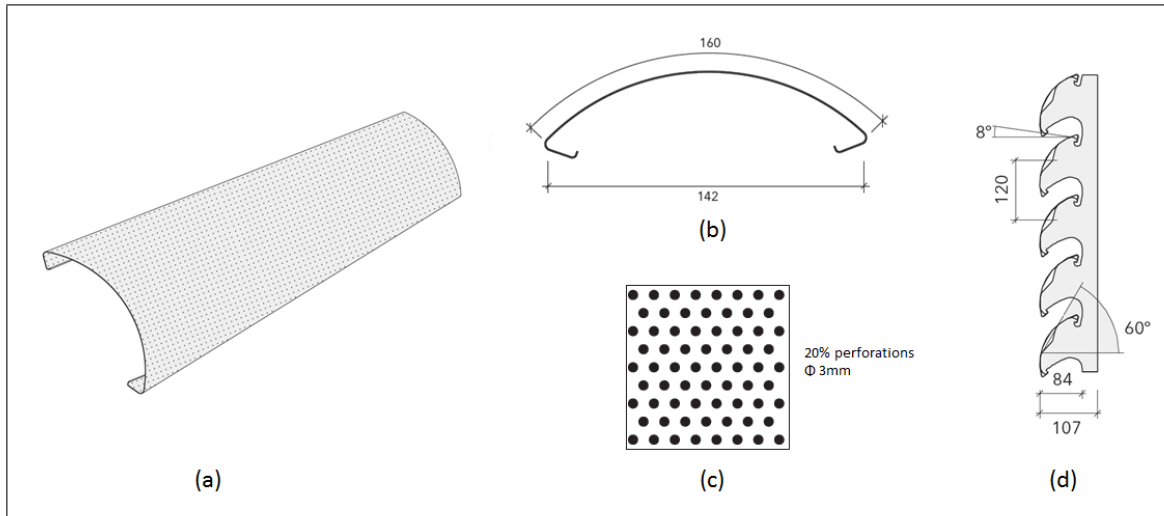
Perforated undulated louvers. (a) 3D view of louver. (b) Louver dimensions (mm). (c) Perforation dimensions (mm). (d) Installed louver dimensions (mm). Adapted from (HunterDouglas, 2013).
